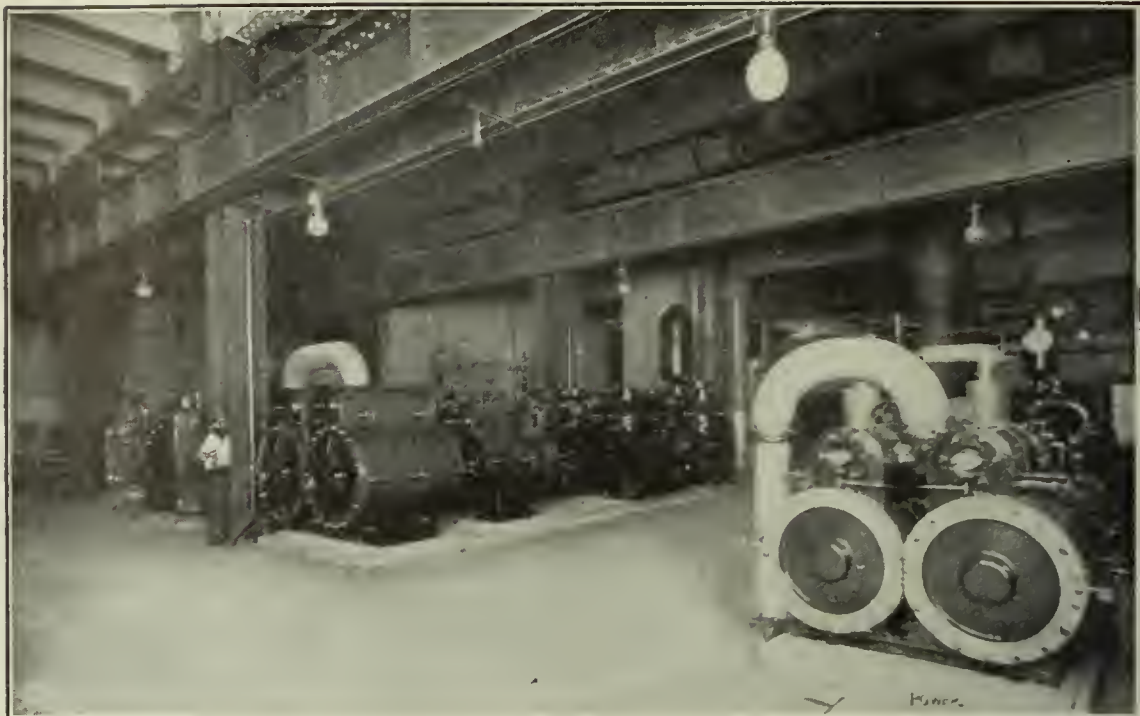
HYDRAULIC ELEVATOR PUMPS
